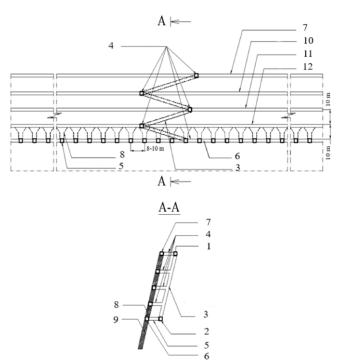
Diagram of the preparation of the mining room in the design area: 1-ventilation level at +110 (in floor); 2-haulage level at +70 (in floor); 3-inclined tunnel connecting +70 to +110 levels; 4-cross-measure drifts; 5-cross-measure drift (ore discharge); 6-haulage level at +70 (in ore body); 7-ventilation level at +110 (in ore body); 8-ore chute; 9-ore body; 10-stratified longitudinal level at +100; 11-stratified longitudinal level at +80
